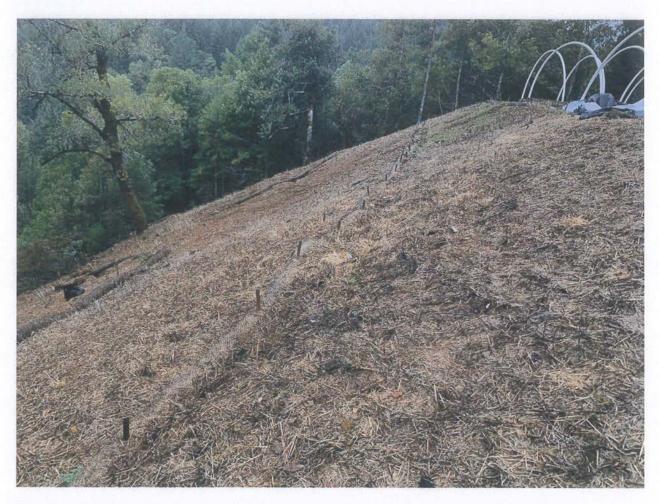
Cultivation Site. Areas to be replanted are the fill-slopes. Photo date 2-4-2021
